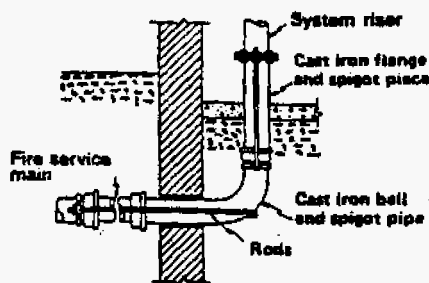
(c) Typical Connection to a Fire Protection System Riser.
